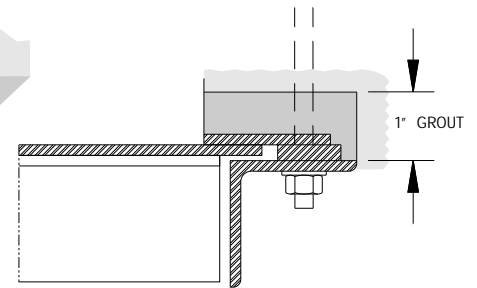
763- Stainless Steel Flat Frame mounting; Section AA
